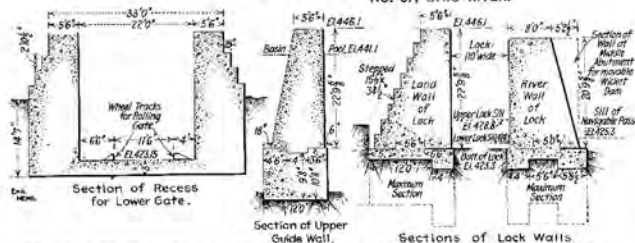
CROSS-SECTIONS OF THE MASONRY WALLS AT THE LOCK AT DAM NO. 37
